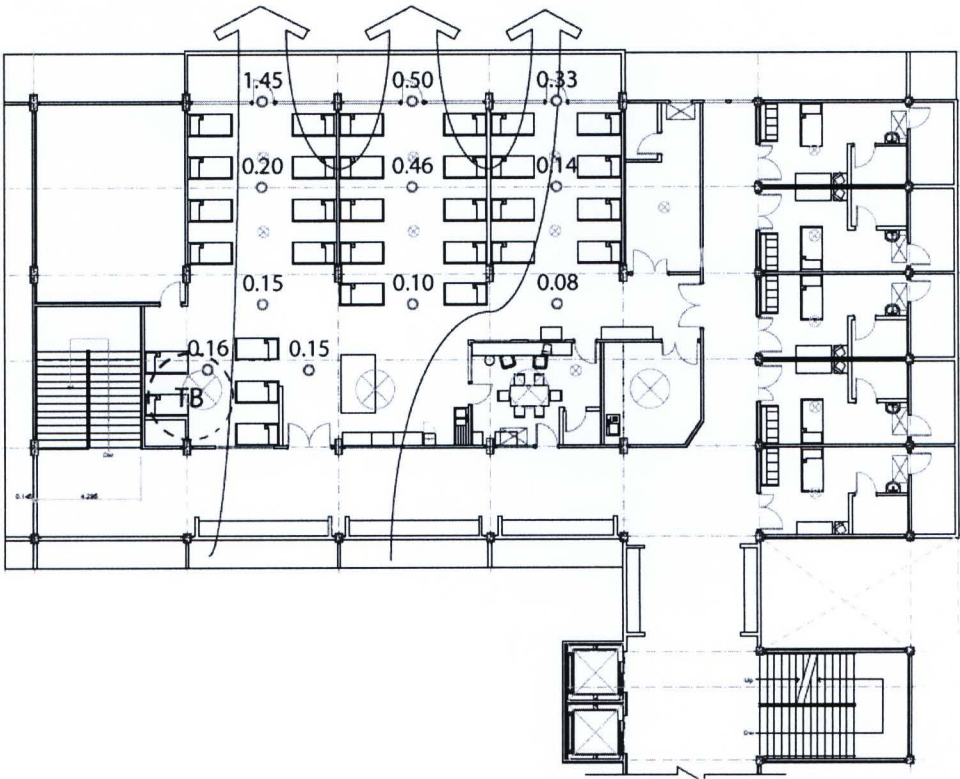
Floor plan and ventilation data of hospital E inpatient ward
